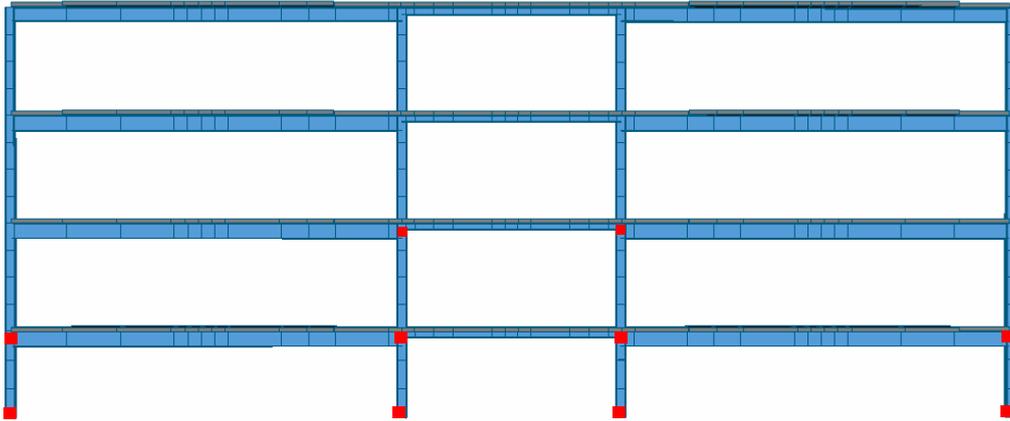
position of the plastic hinges at failure of the “Luxembourg” building
